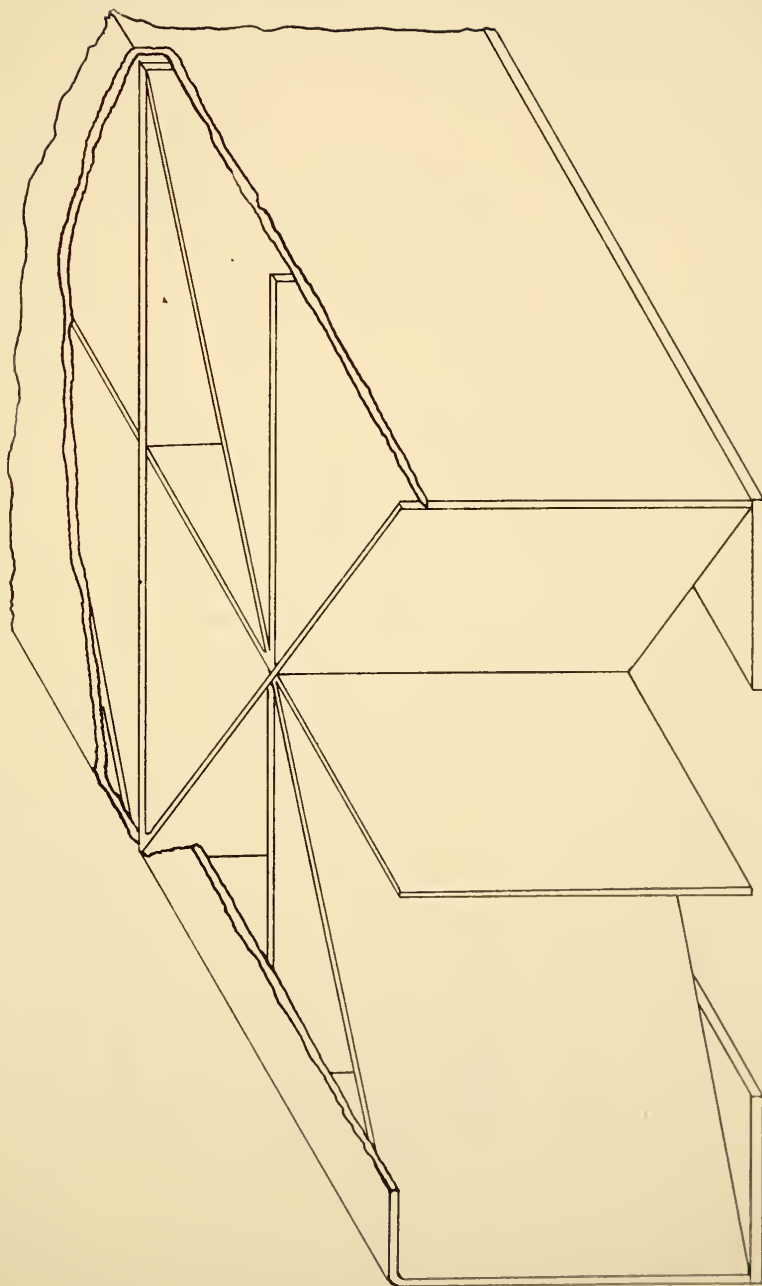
ISOMETRIC DRAWING OF BEAM CROSS SECTION SHOWING METHOD OF BRACING
